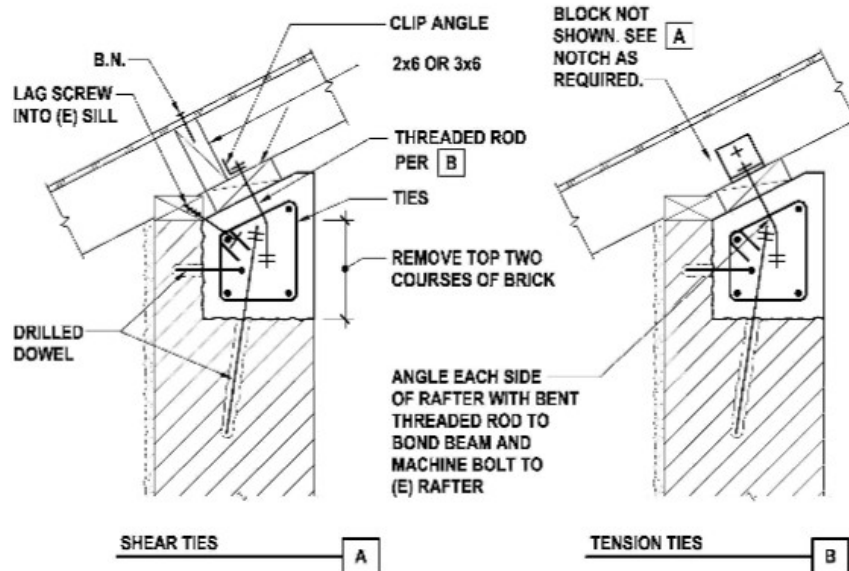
Bond Beam at a Sloping Roof with Limited Clearance
